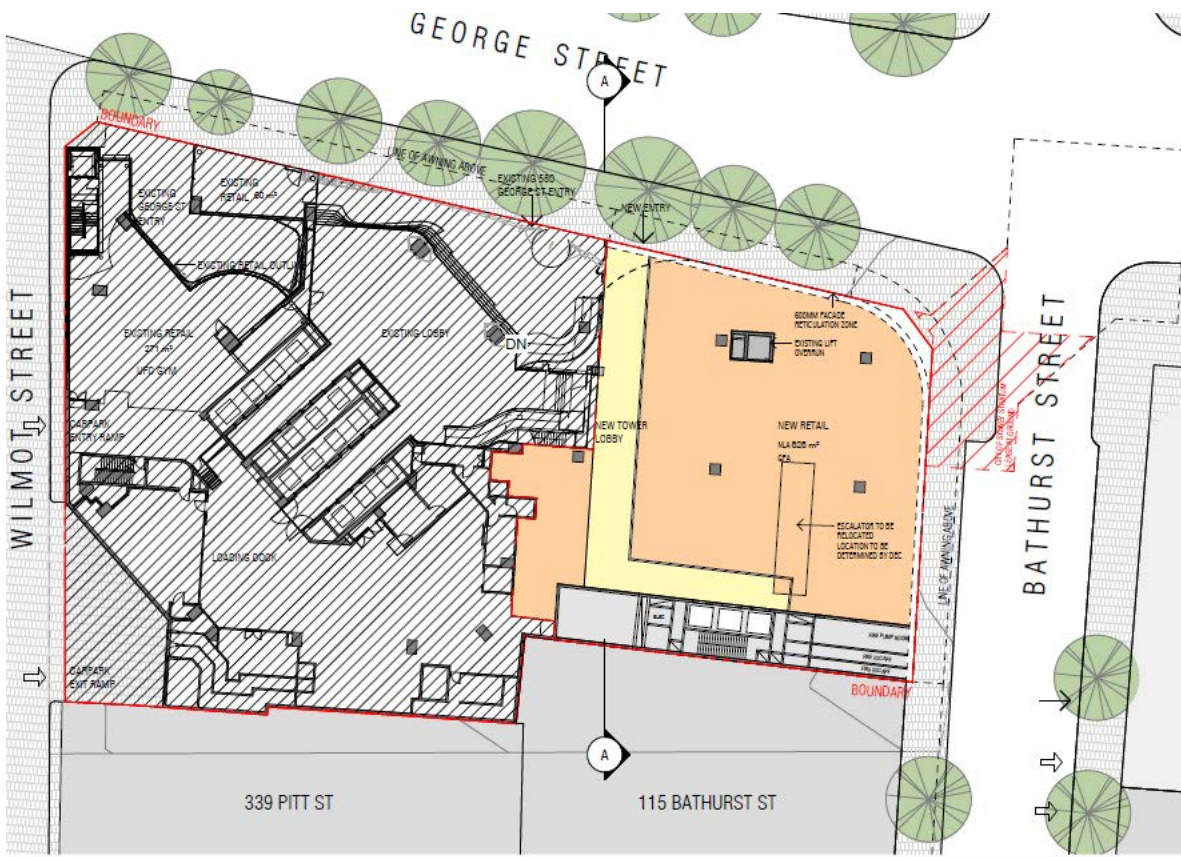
Extract of proposed plans showing proposed Ground Floor Plan.
